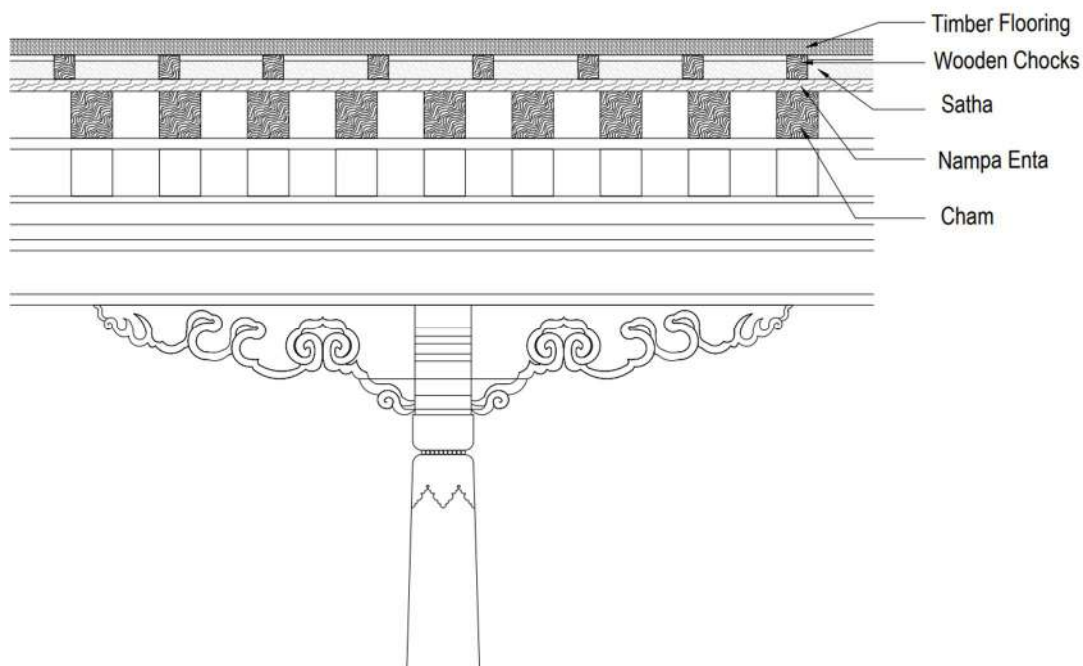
Cross-section of a timber floor –1st and 2nd floor (wooden chock should be right above nampang)
